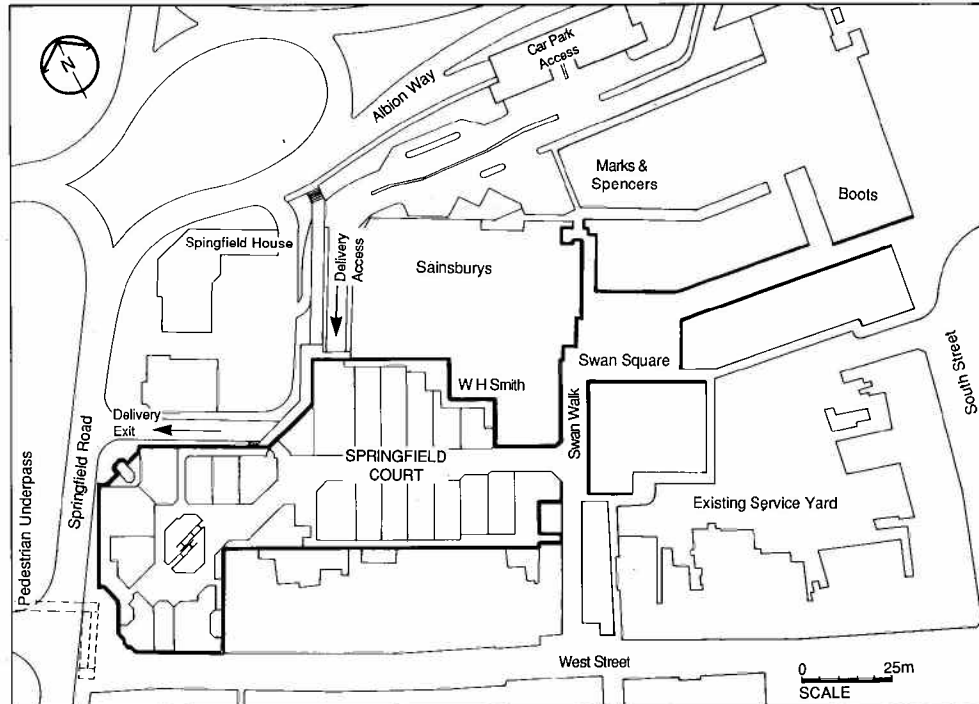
Site plan of Springfield Court and Swan Walk shopping developments, Horsham
